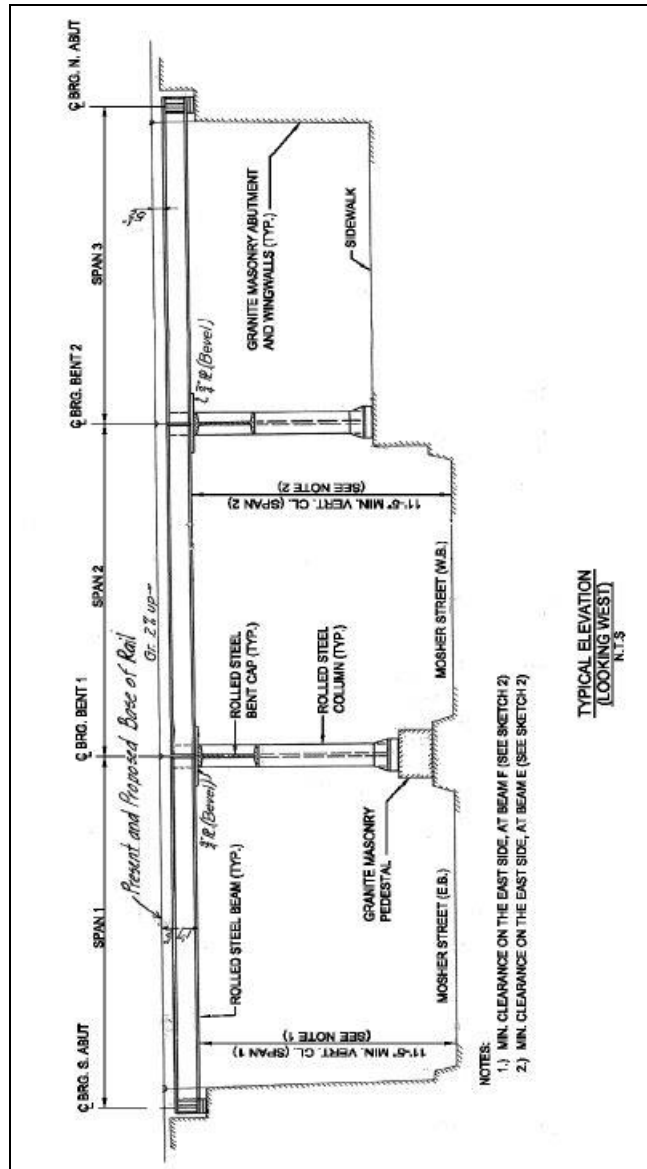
Typical Elevation (source: HTNB Bridge Load Rating Report, August 2013).
